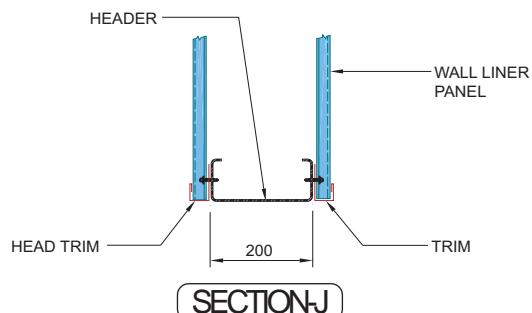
DETAIL : LINER AT WALL WITH PERSONNEL DOOR
